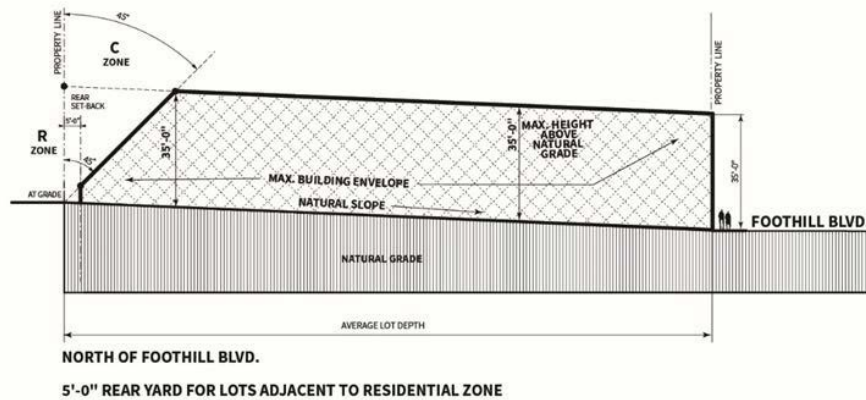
B: BUILDING OR STRUCTURE HEIGHT
